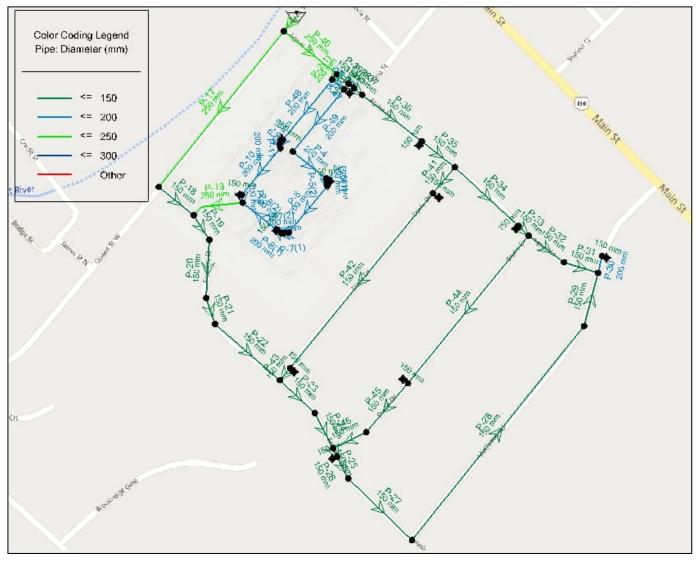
Agnes St Subdivision & Local Network Layout with Pipe IDs and Diameters
